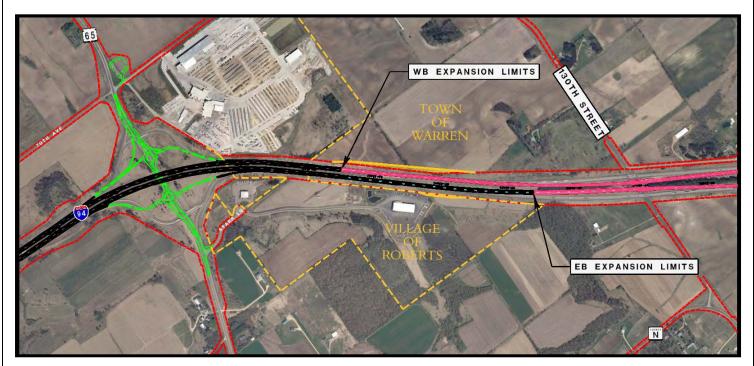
A – Proposed Action Expansion Limits East of WIS 65
